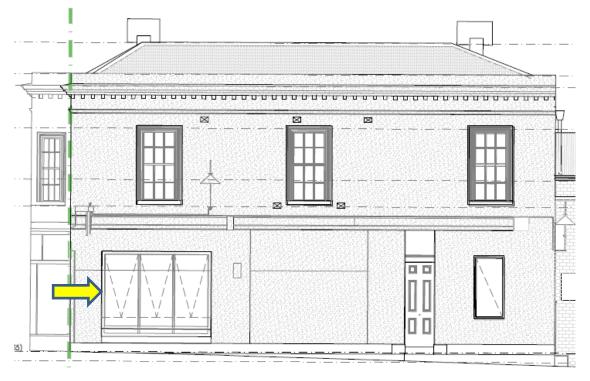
Liverpool Street elevation of Jobs Warehouse. New opening marked by yellow arrow (source: application plans prepared by Point Architects)
